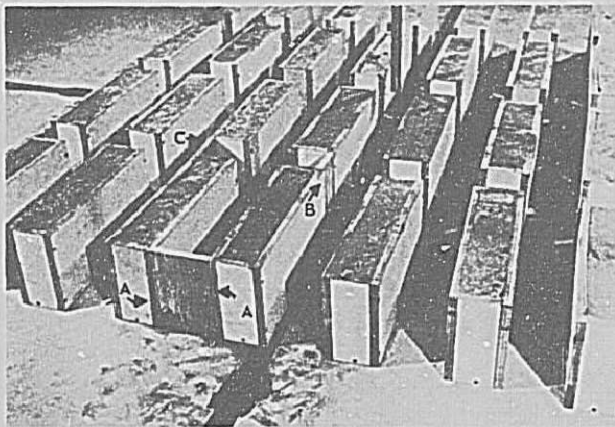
Test 10. Arrangement of pillars for backfill material pumped into a dry cavity. Blocks in one corridor were placed at A, B, and C as shown. Photo P801-D-73849
